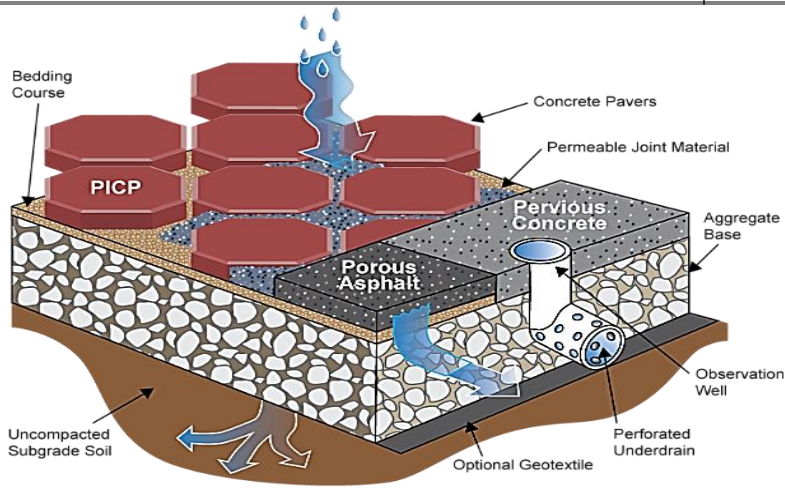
Layers in permeable pavement (Samadhana, 2023).
